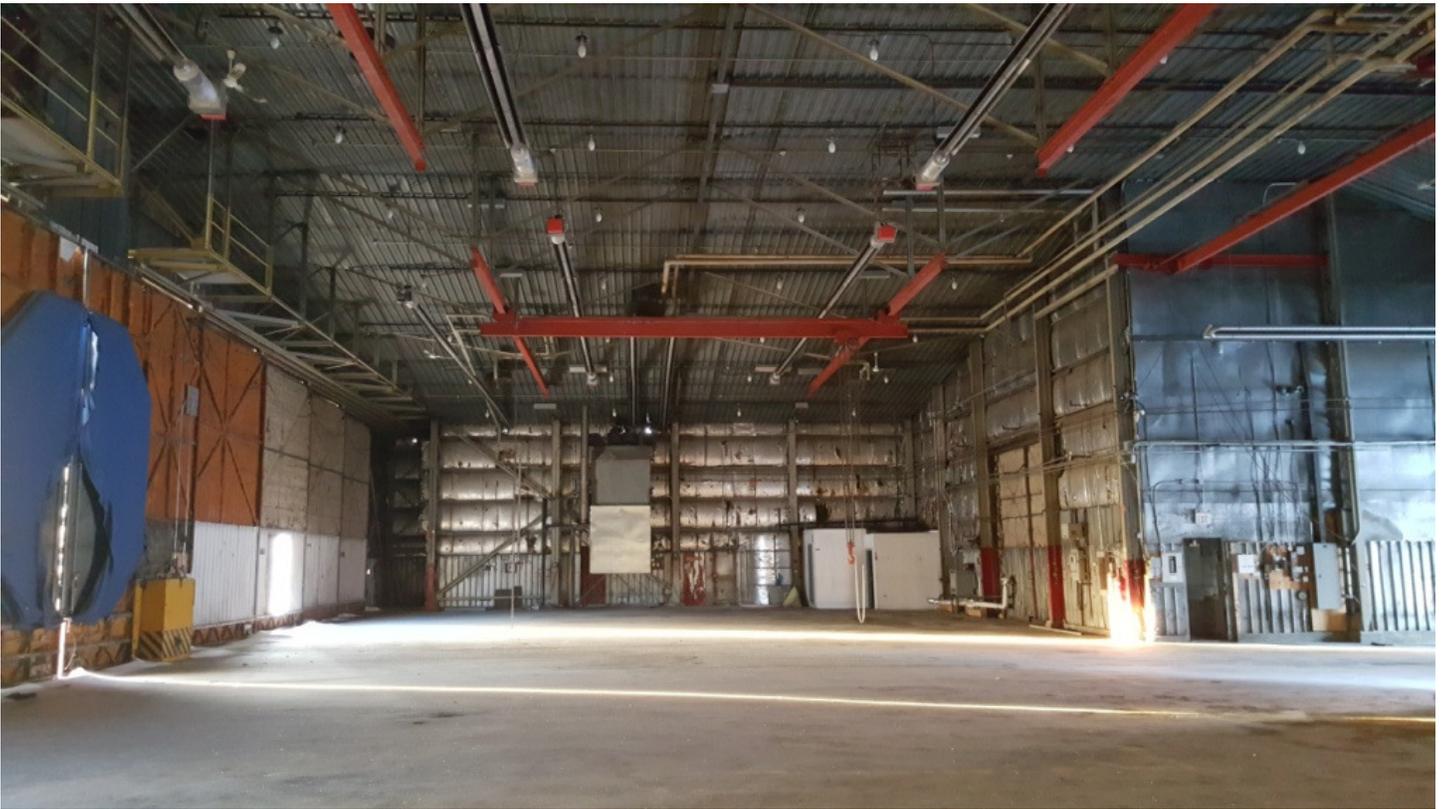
Overall Interior Elevation – Showing Roof Structure and Roof Supported Equipment.
